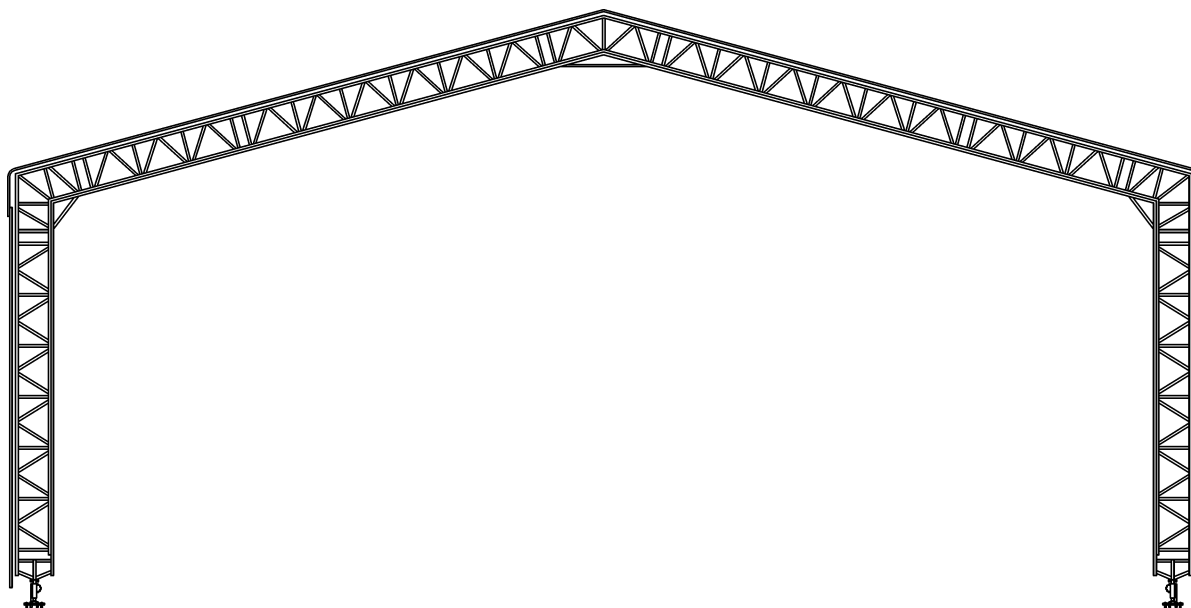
Example of an encapsulation consisting of a complete temporary construction including roof, walls and supports
